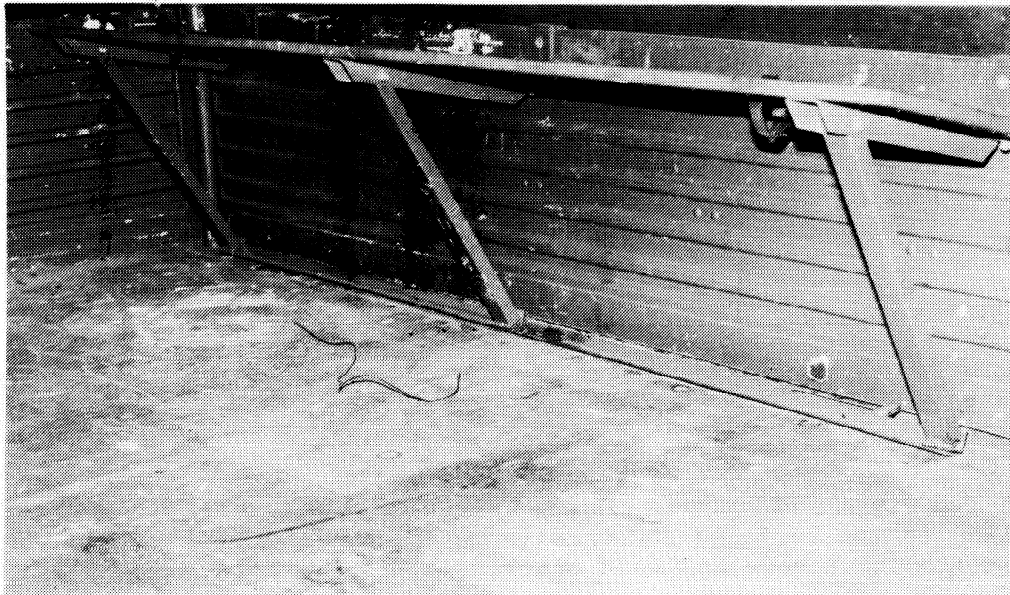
WELDING OF STRUCTURAL ANGLE TO SEAT LEGS
